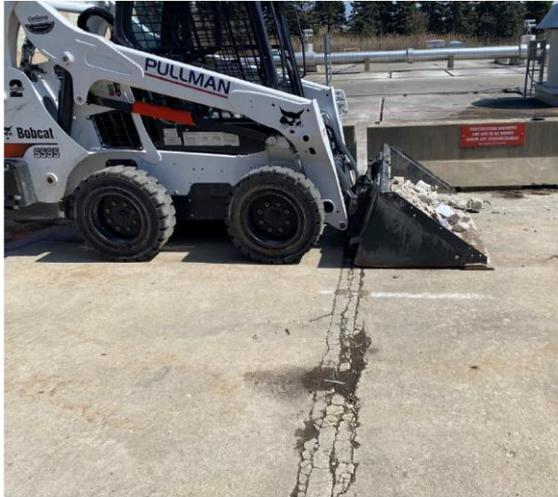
Spalled concrete around control joint west of Headworks Building.
